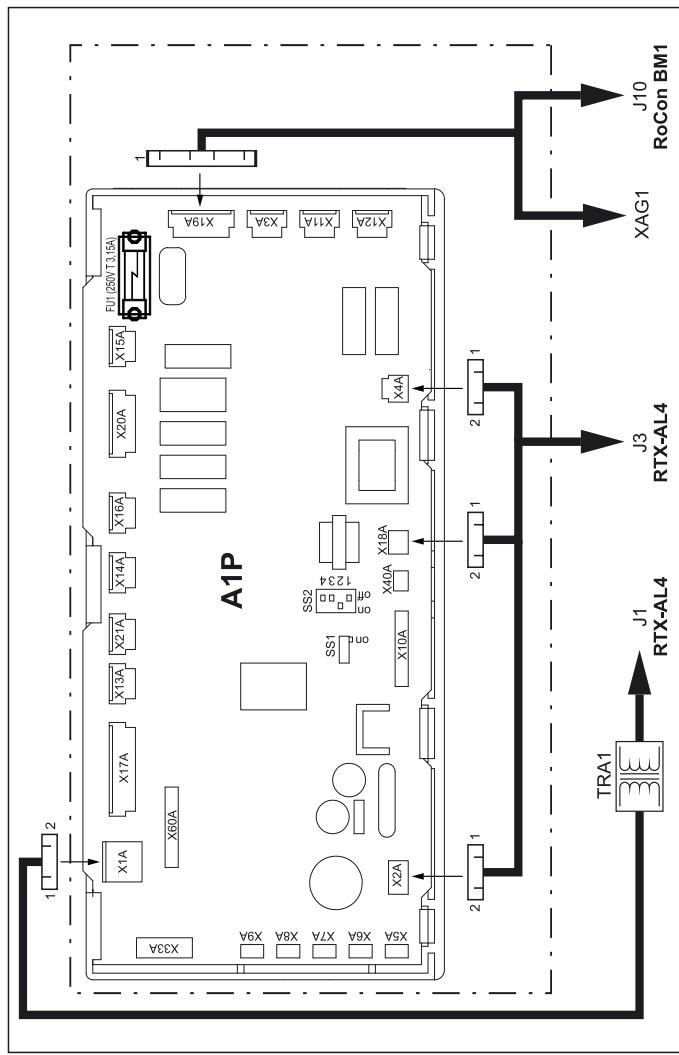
Circuit board A1P (basic control of the heat pump)
